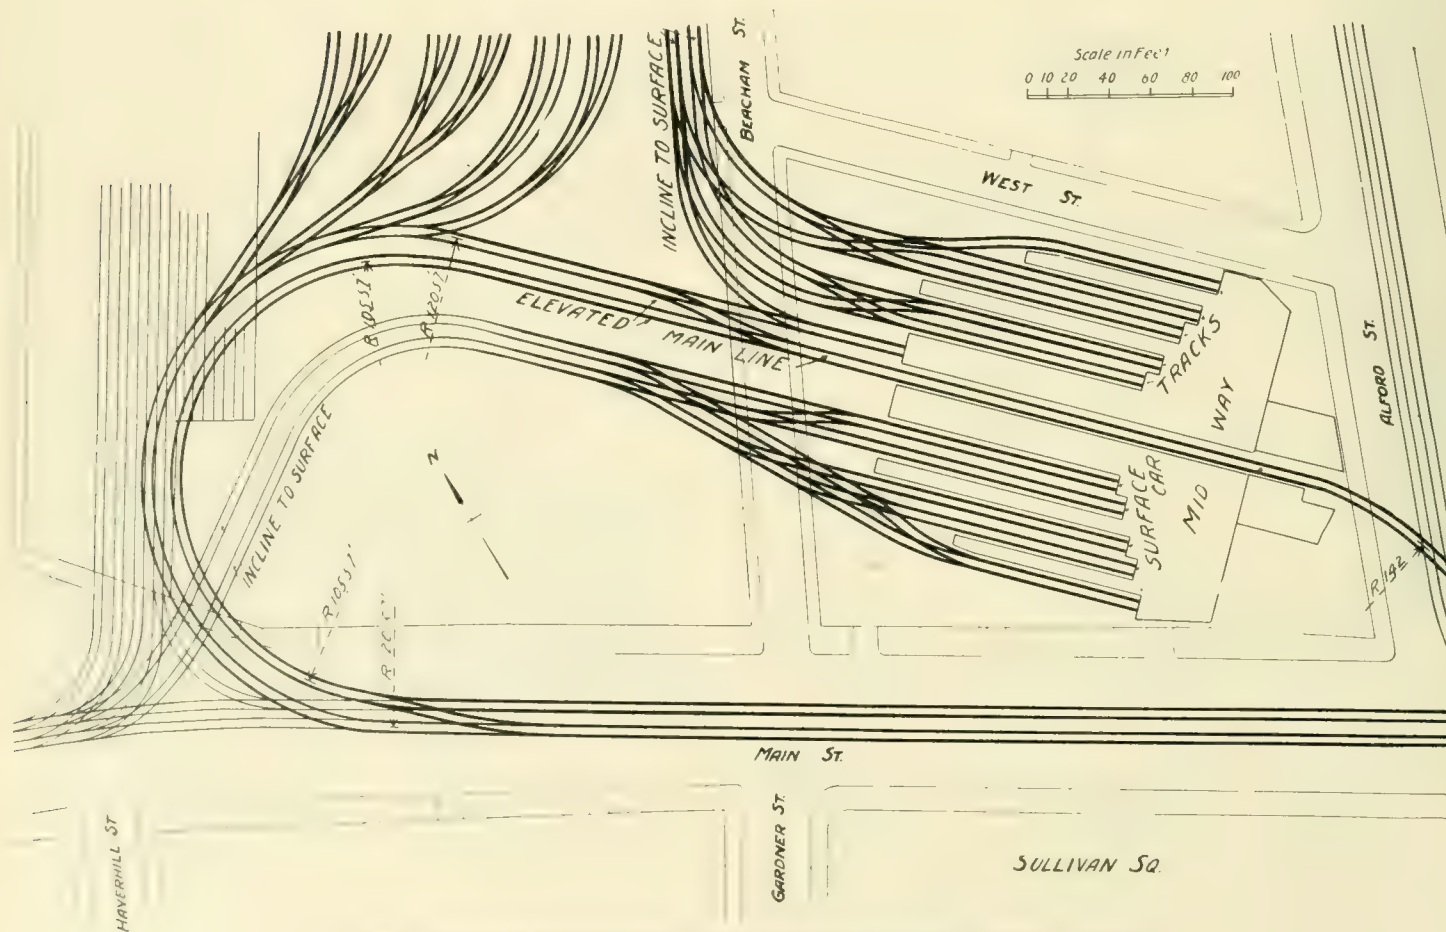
LAYOUT OF ELEVATED AND SURFACE TRACKS AT SULLIVAN SQ. STATION.
